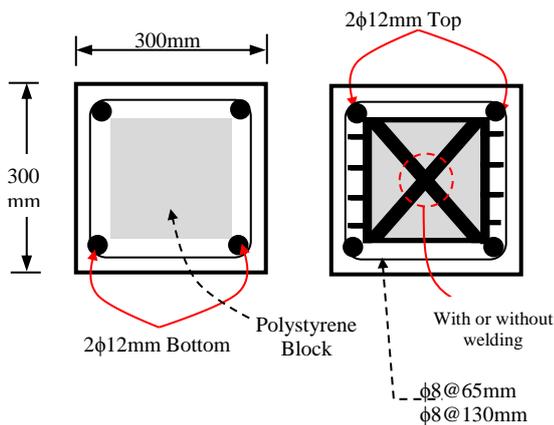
Cross-section in strengthened and non-strengthened beam specimens
